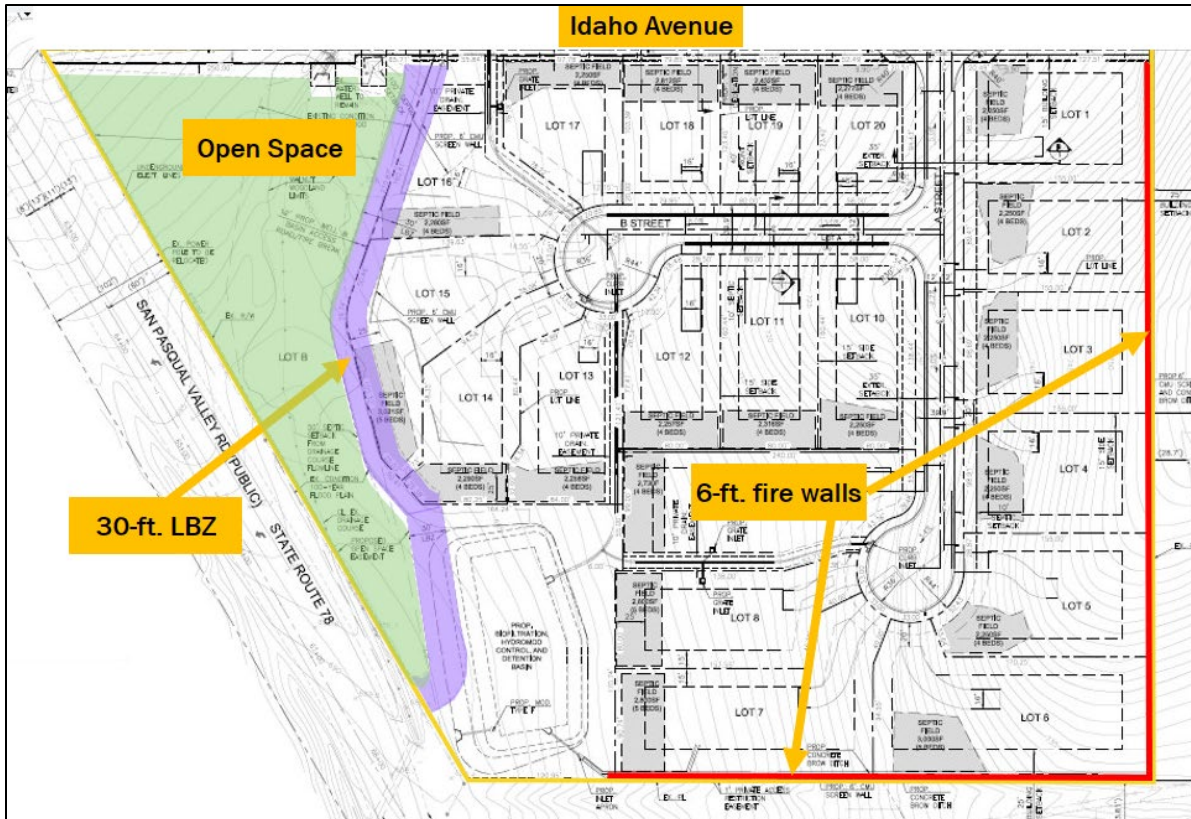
Limited Building Zone; Biological Open Space Easement and Fire Walls
